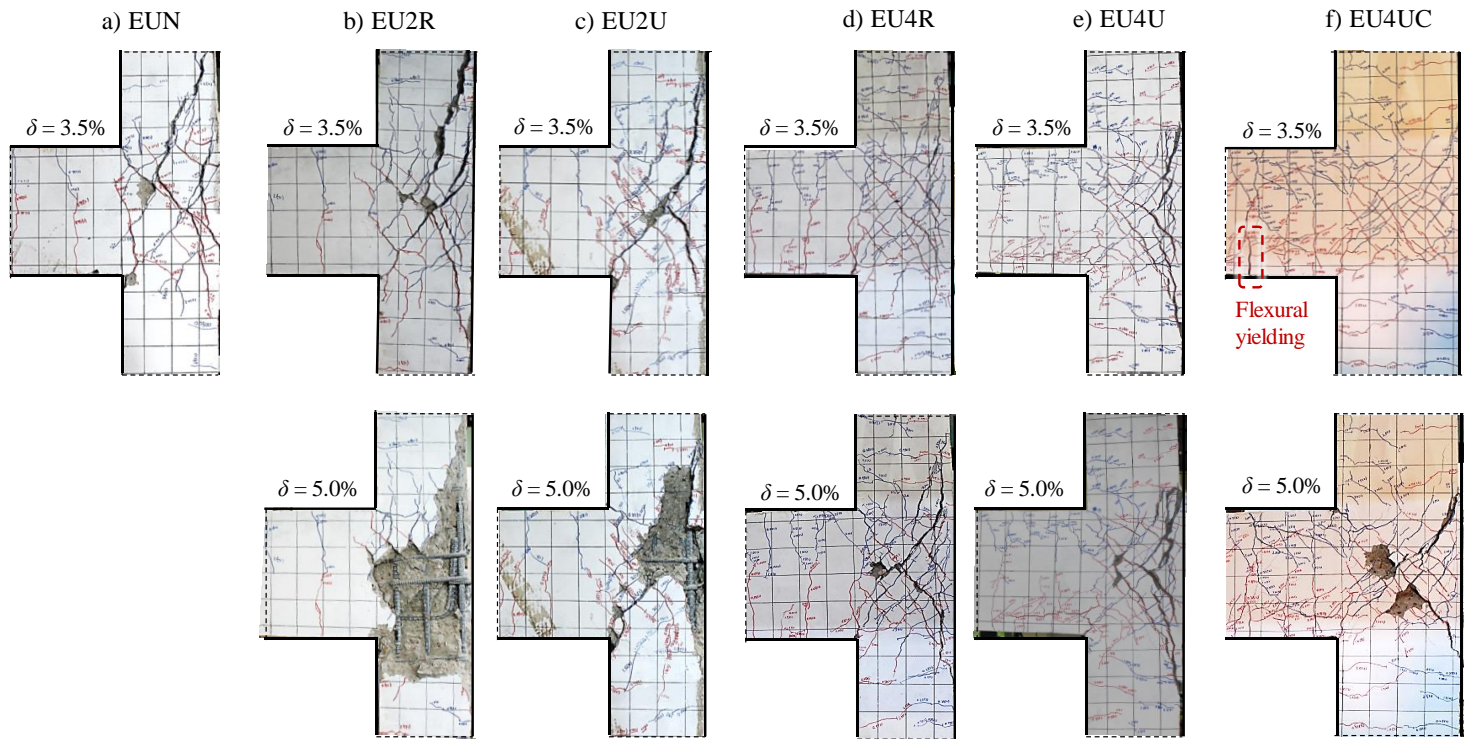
Cracking patterns and failure modes of exterior connection specimens at each drift ratio
